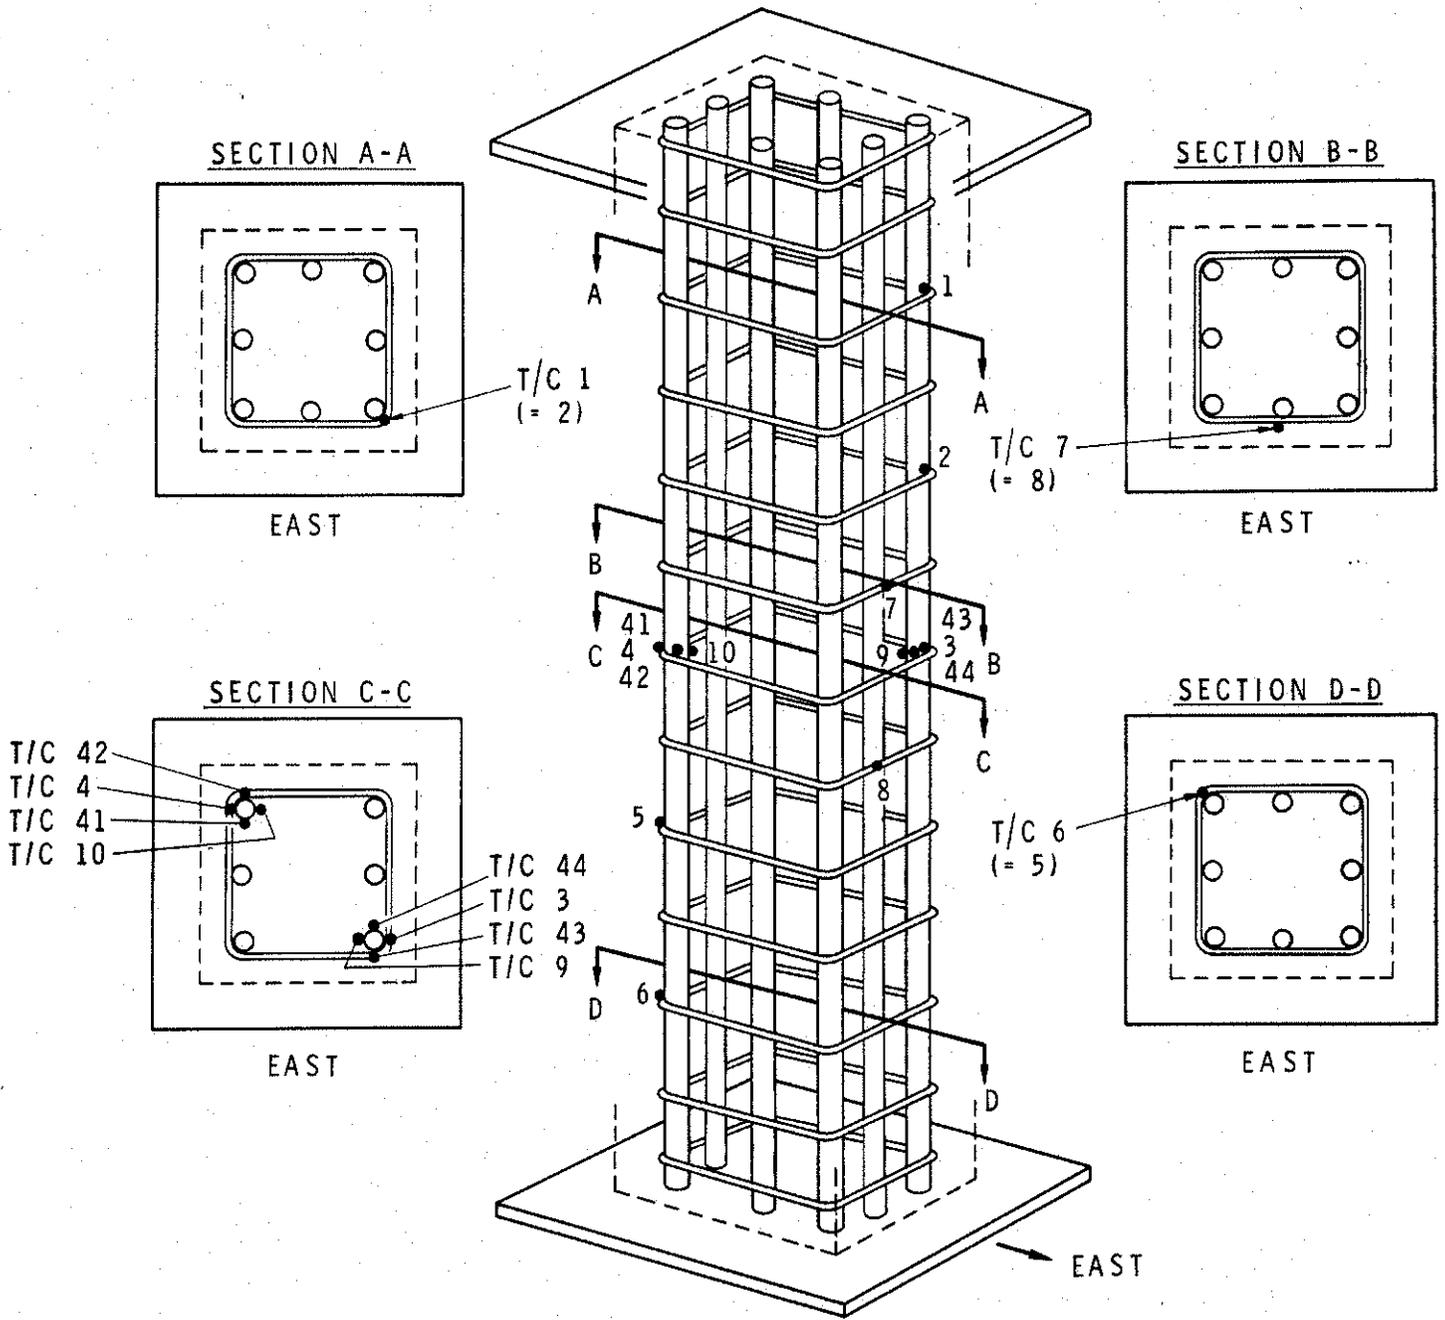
LOCATIONS OF T/C'S ON REINFORCING BARS:
